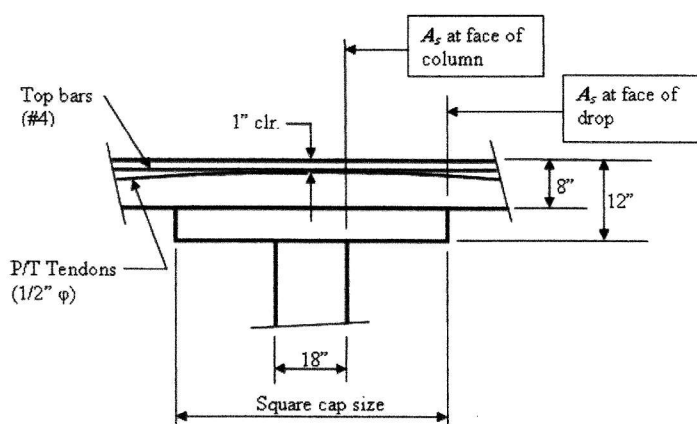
Detail of a slab-column joint. (Note: 1 in. = 25.4 mm; #4 = No. 13.)
